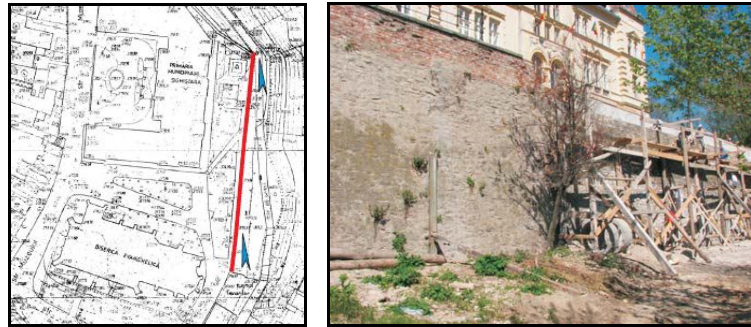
The fortress wall –Section 1, Plan and image, 2007
